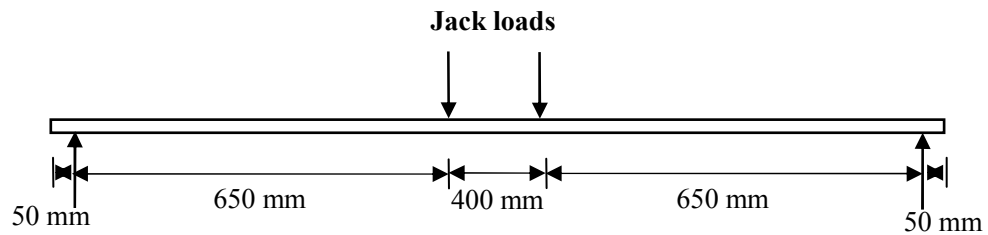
Four point loading set-up (Photiou et al, 2006a)
